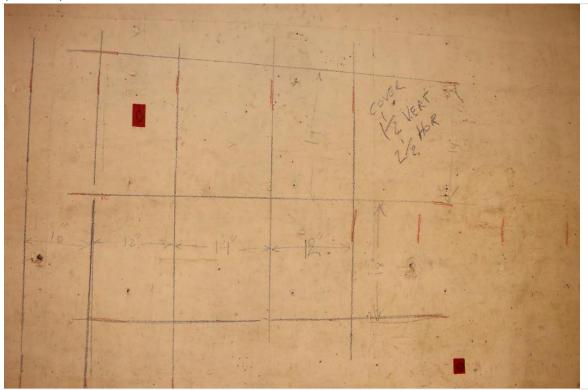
Concrete coring, West Wall, 1962 Construction - Basement (BA2-33)
